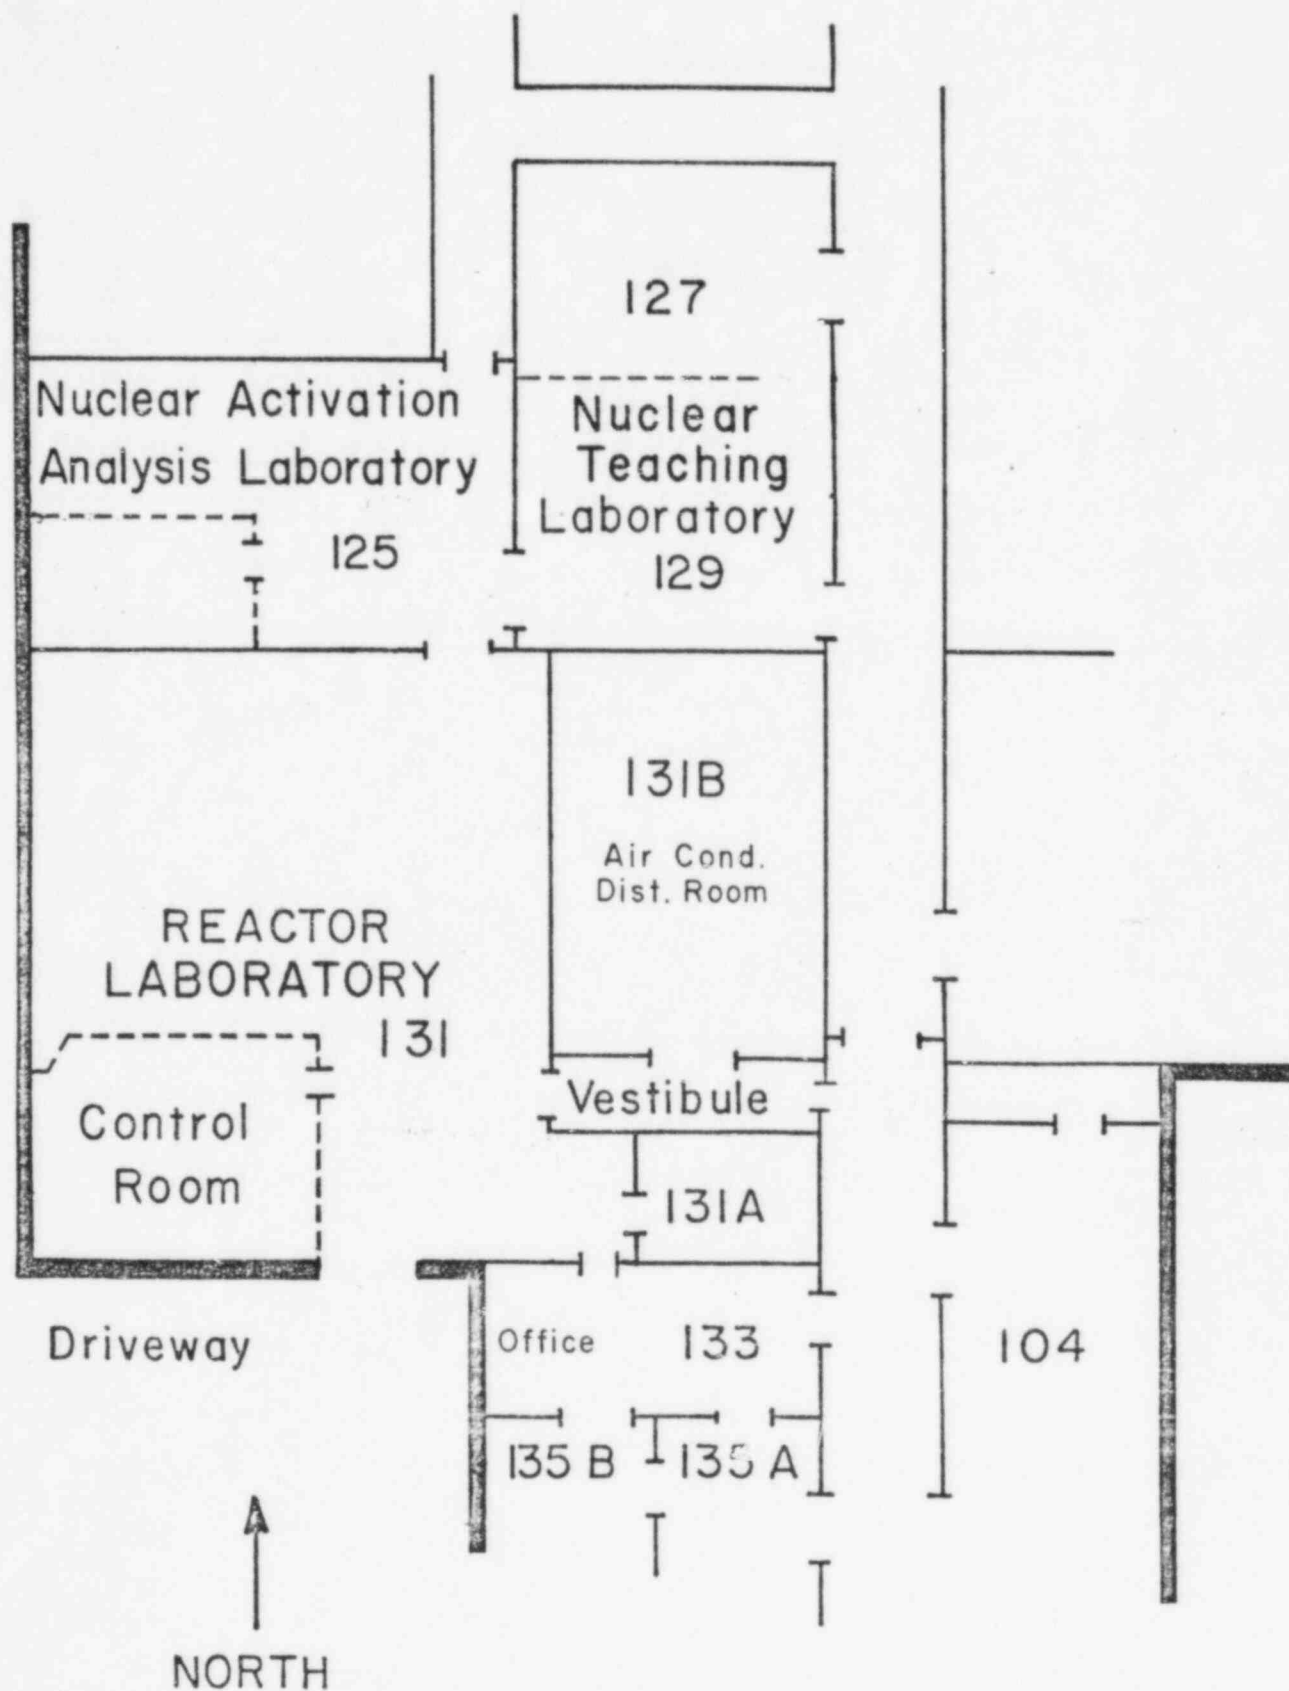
TAYLOR HALL FLOOR PLAN
